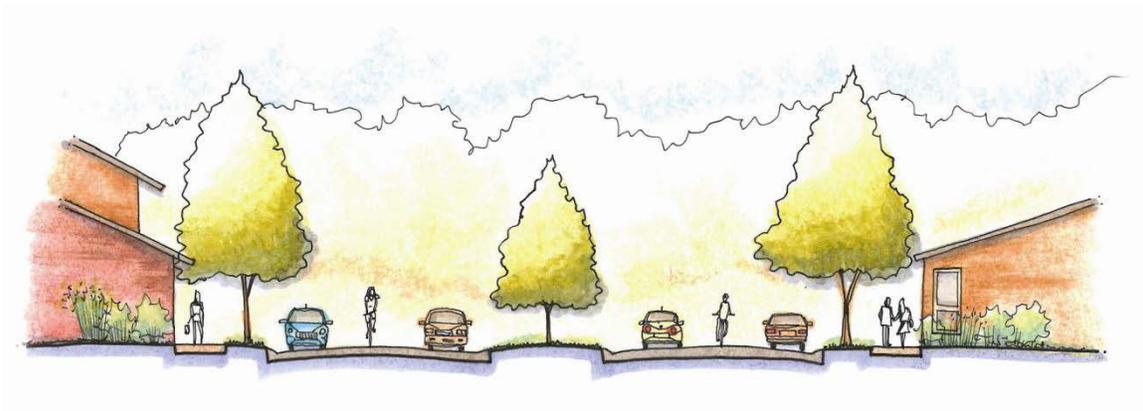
F: Typical cross-section of a traditional neighborhood development arterial street with parking on both sides of the street
